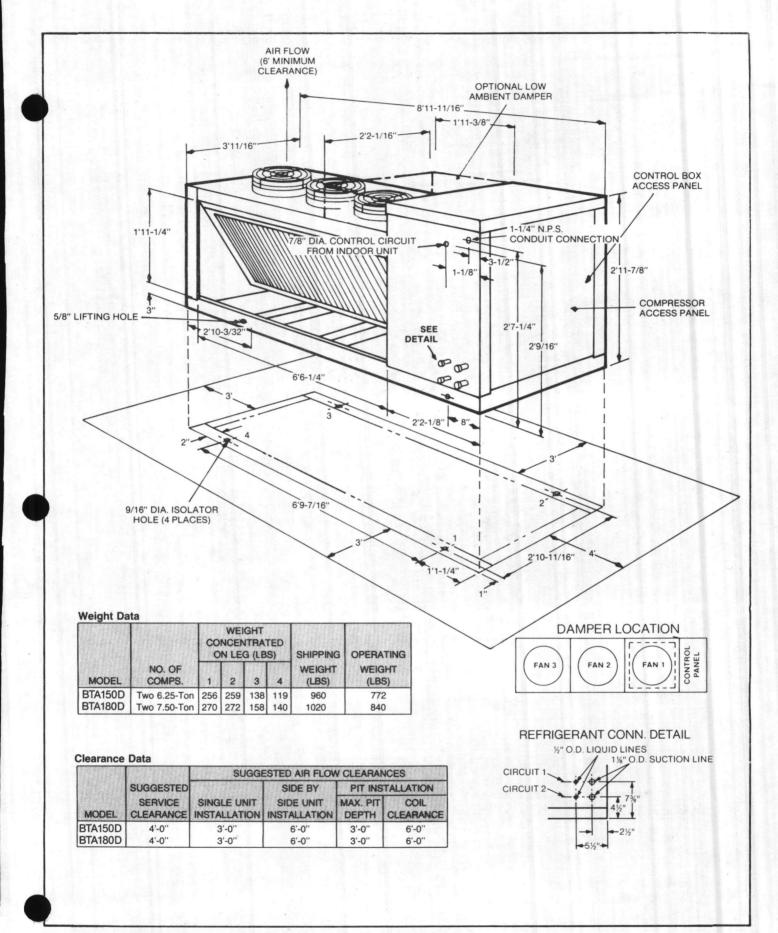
Dimensions, Weights, and Clearances for BTA150D and 180D Units
